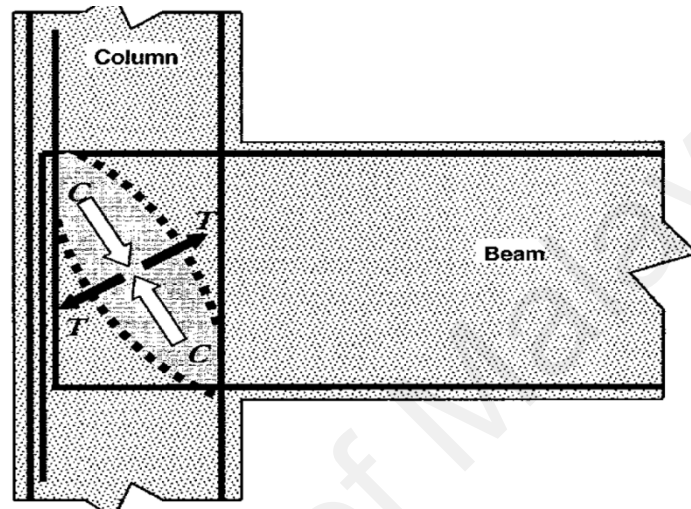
Diagonal compression and tension zones in exterior RC beam-column joint (Murty et al., 2003)
